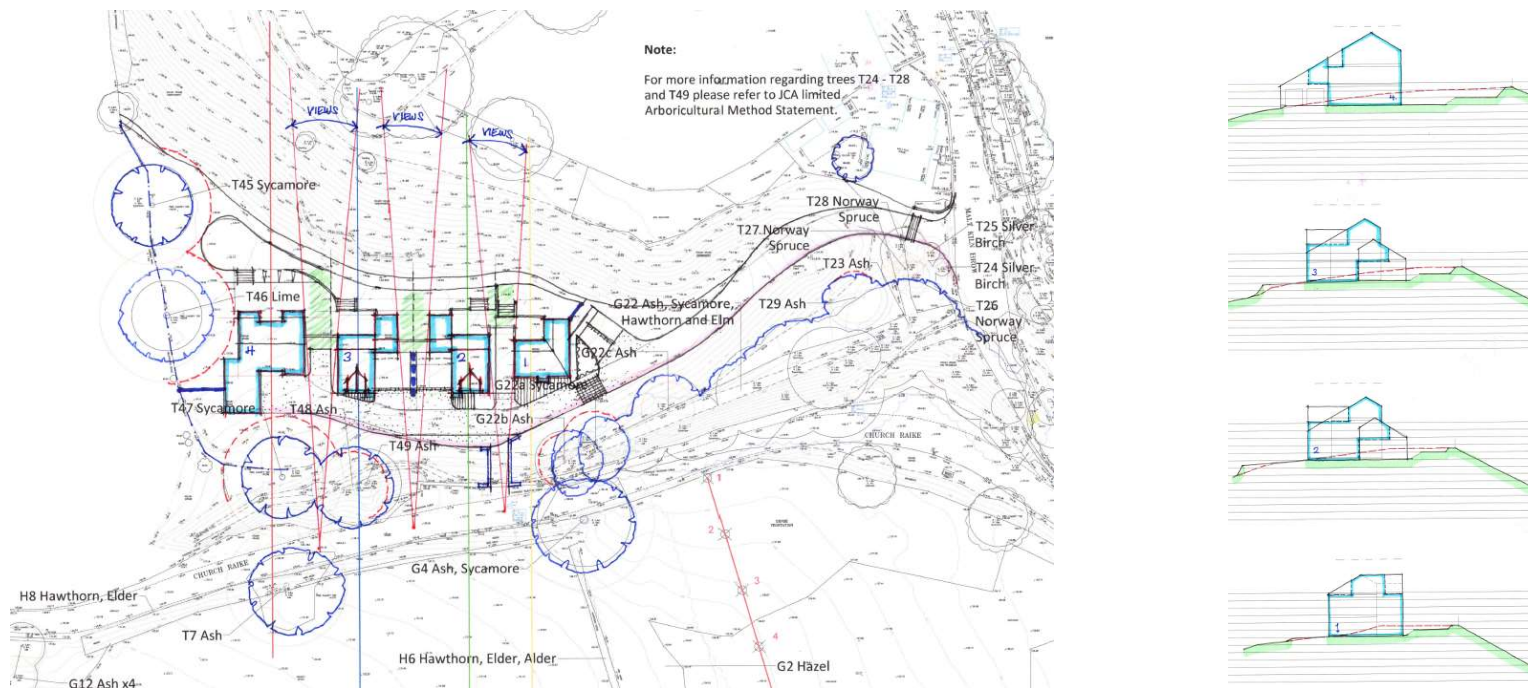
Initial Layout Design and Cross-Sections (Prior to Pre-Application Meeting with RVBC)
